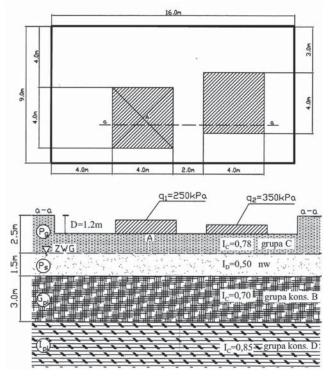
Ground plan of the excavation for foundations of the calculated example with a vertical cross-section
